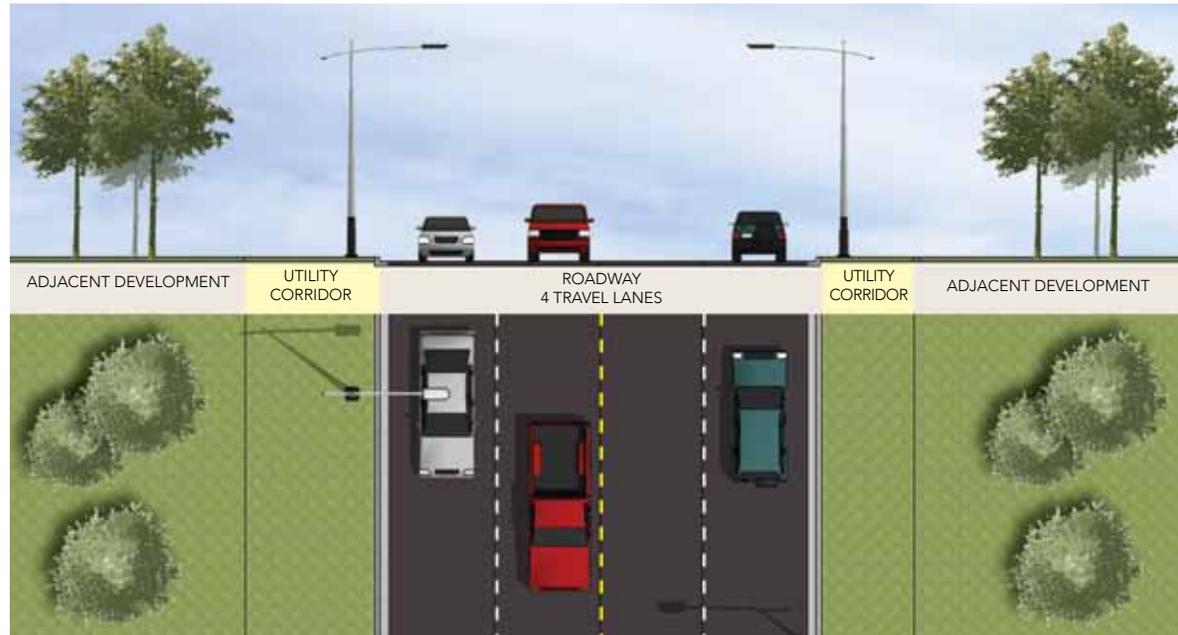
County Road 400 North- Cross section and plan view of proposed roadway character.
